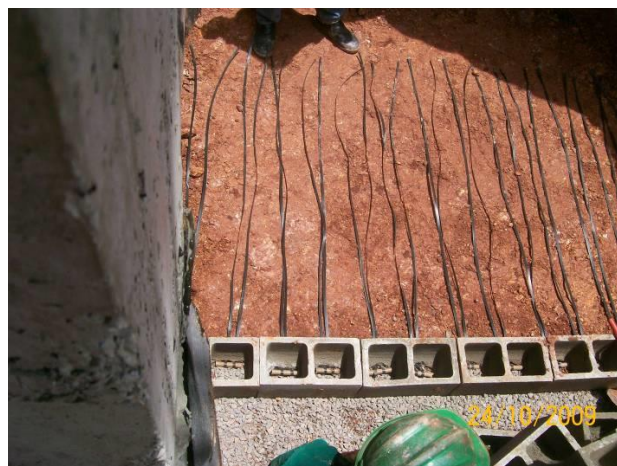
Realization of the first layer of the entrance wall with arching tape and facing of concrete blocks.
